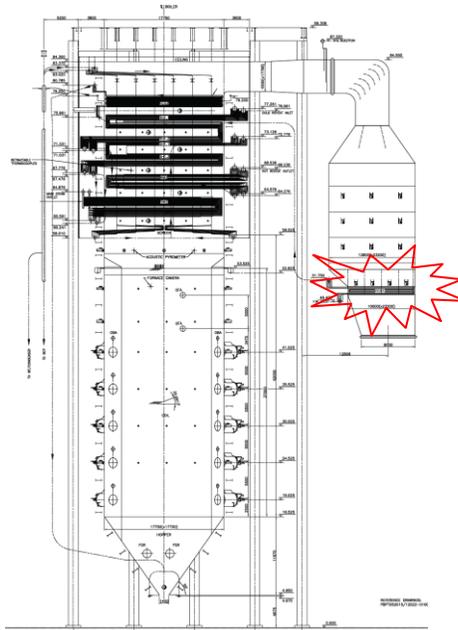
Section view boiler pressure part Porto Tolle 3x660MW arrangement of split ECO
